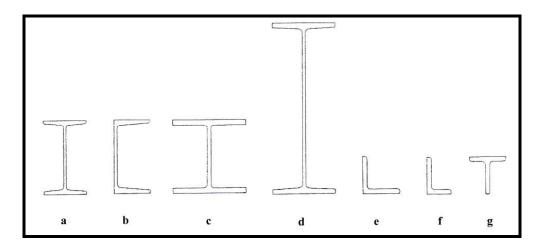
Typical hot rolled steel sections (Foster, 1983:143).
